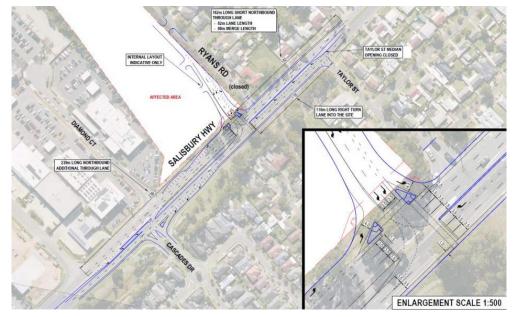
Concept Plan of New Access Point Traffic Signals
